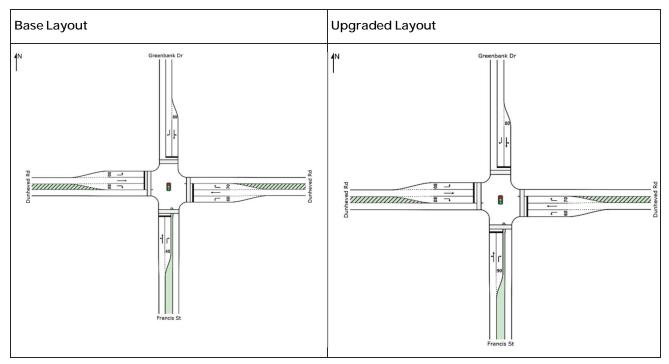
2031 with Links Road extension - Dunheved Road/Greenbank Drive/Francis Street
